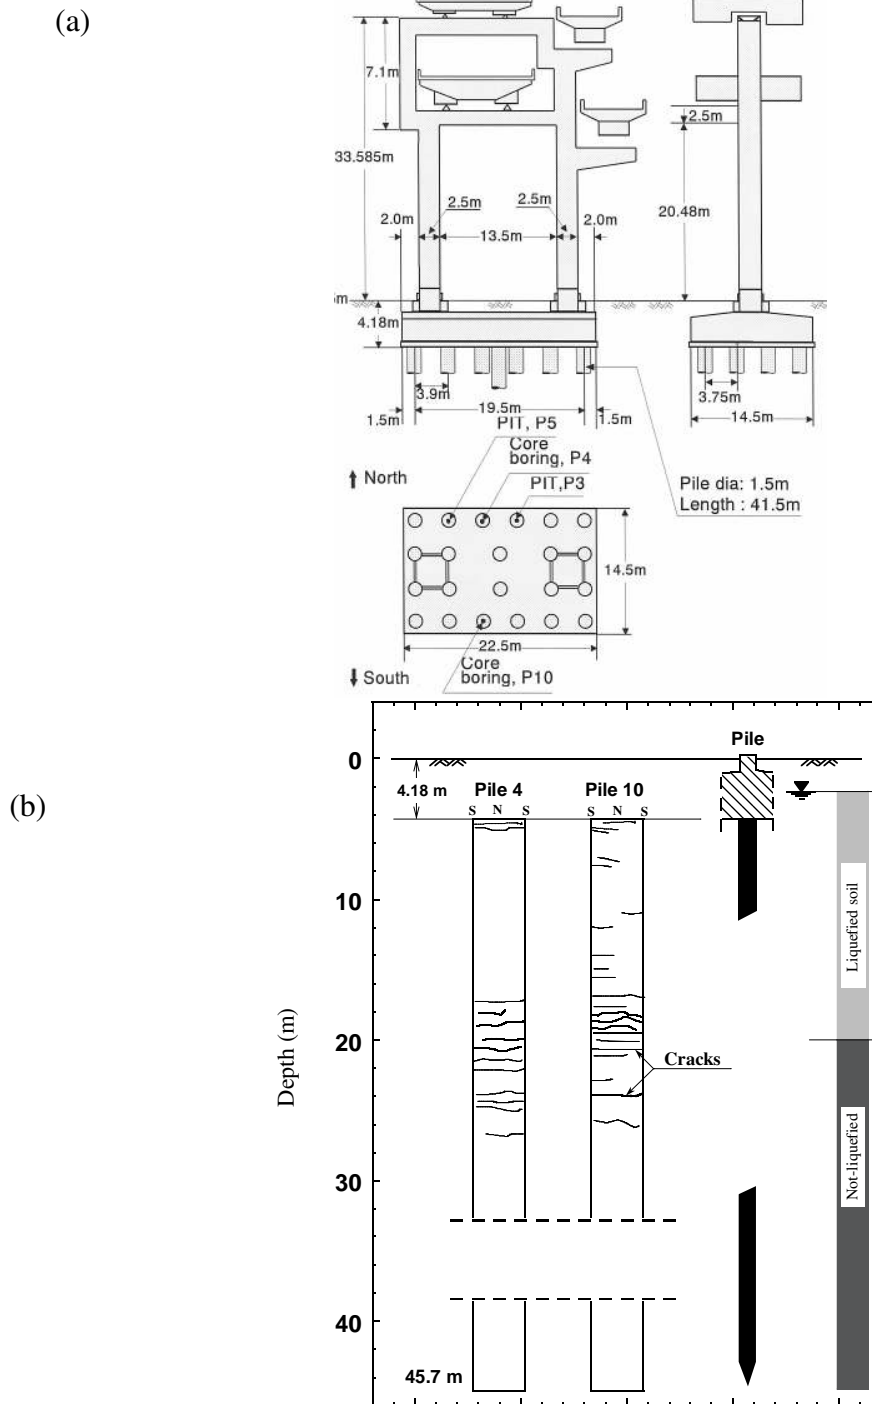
Uozakihama Bridge Pier 211: (a) Side view of the pier and plan view of the foundation; (b) Observed damage to piles (Hanshin Highway Authority, 1996)
